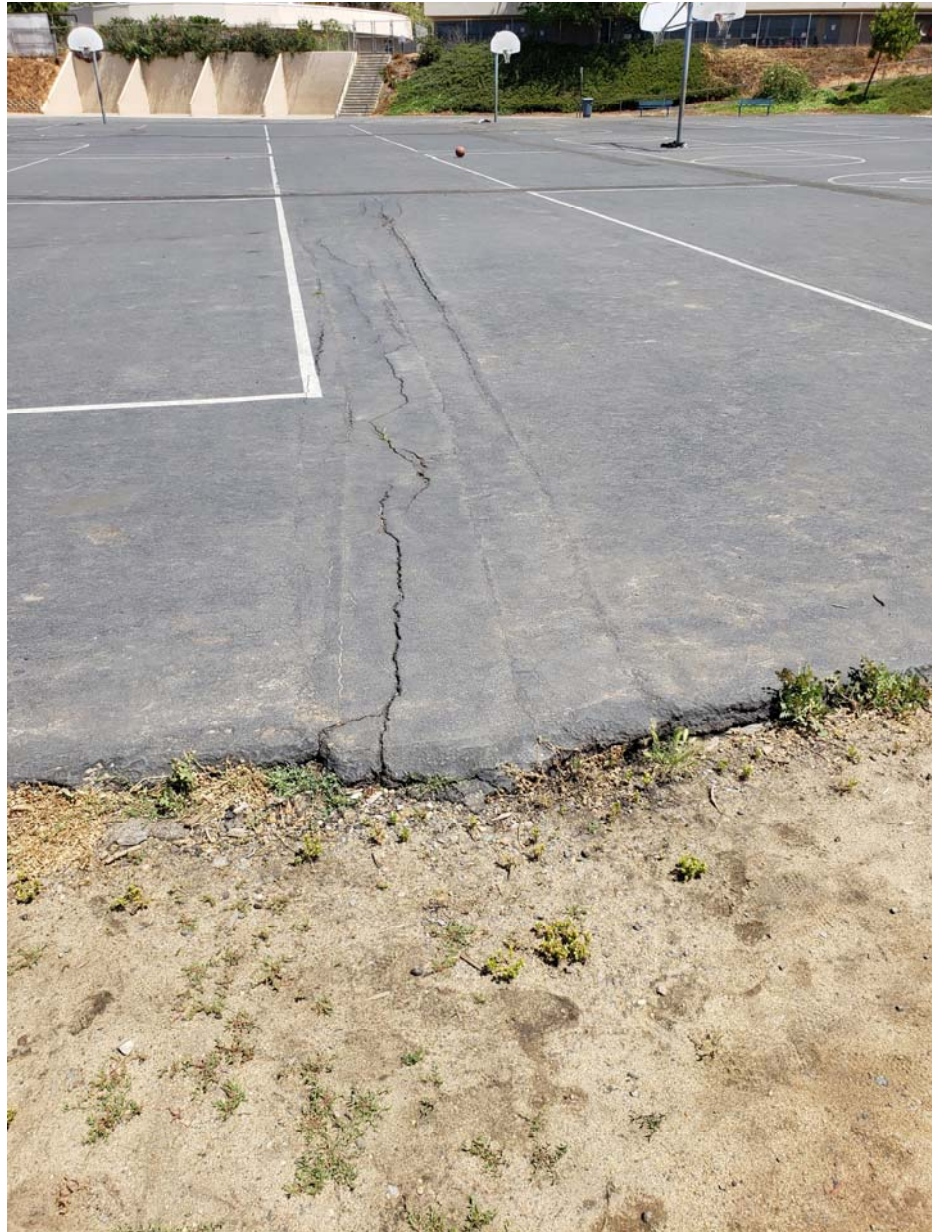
View of hardcourt play area looking west. Previously patched cracks reopening.
